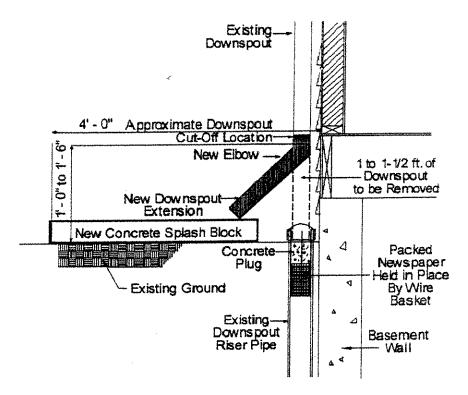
Relocated Downspout and Plugged Riser Pipe
